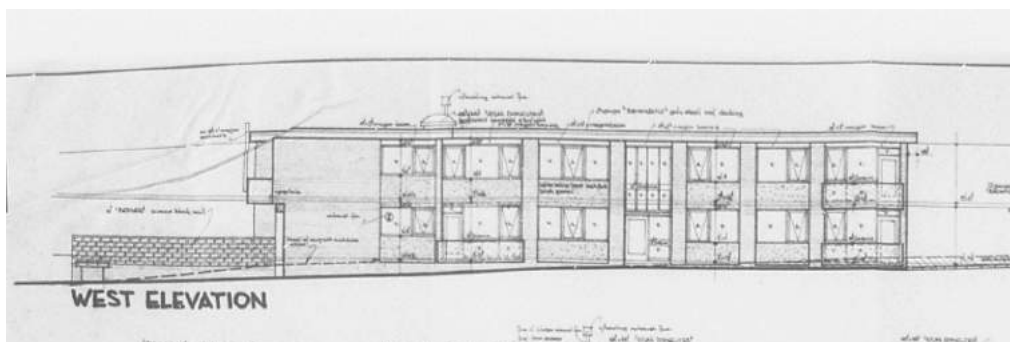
Working Drawings, West elevation for Units at 16 Gillard Street, Brighton (Source: Bayside Council Building Files)
